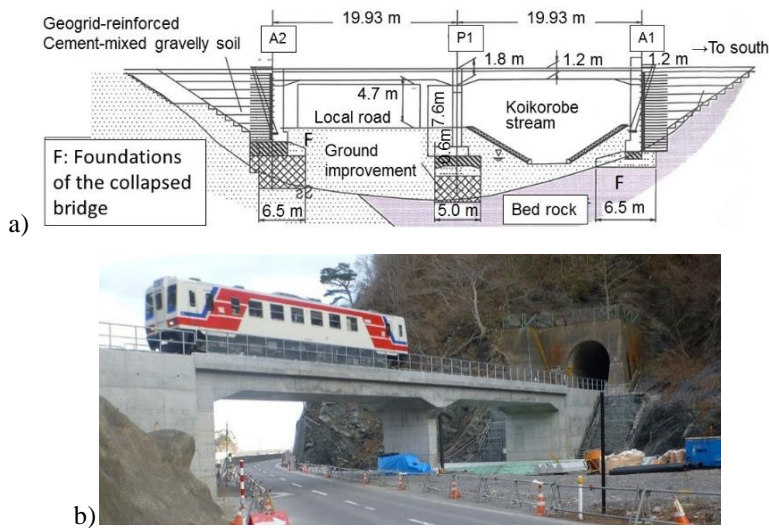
GRS integral bridge at Koikorobe, Sanriku Railway: a) elevation from the inland; and b) view on the day of re-opening (6th April 2014).
